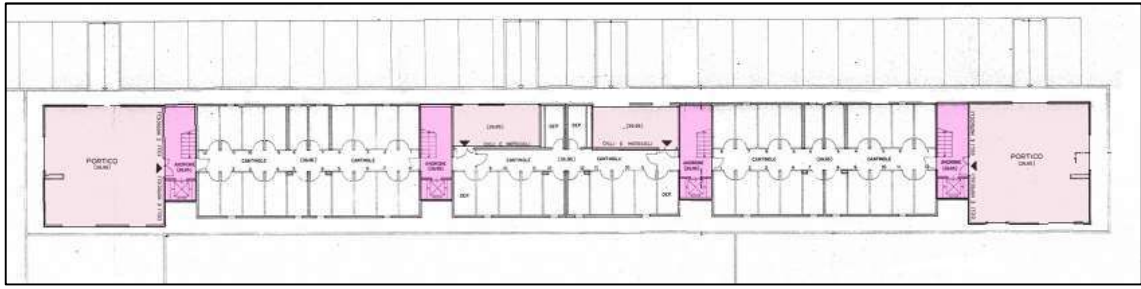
Ground floor plan with the identification of the porches and stairwells.
